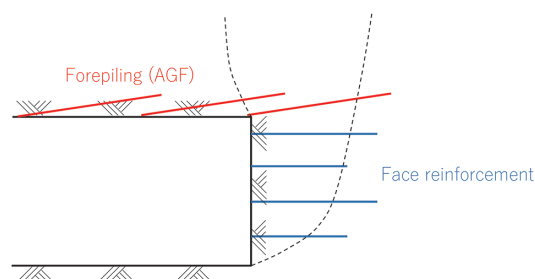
Schematic drawings of forepiling method and face reinforcement method
